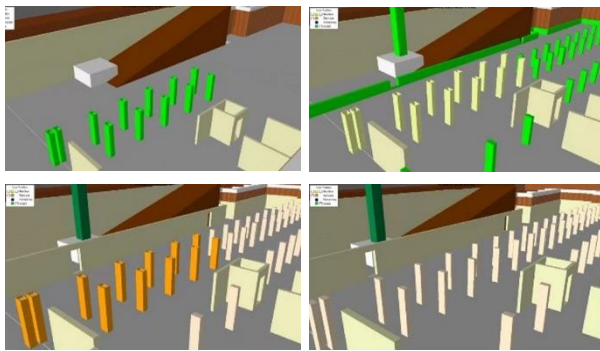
Procedure of construction of concrete formwork, concrete casting and formwork removal of the basement columns
